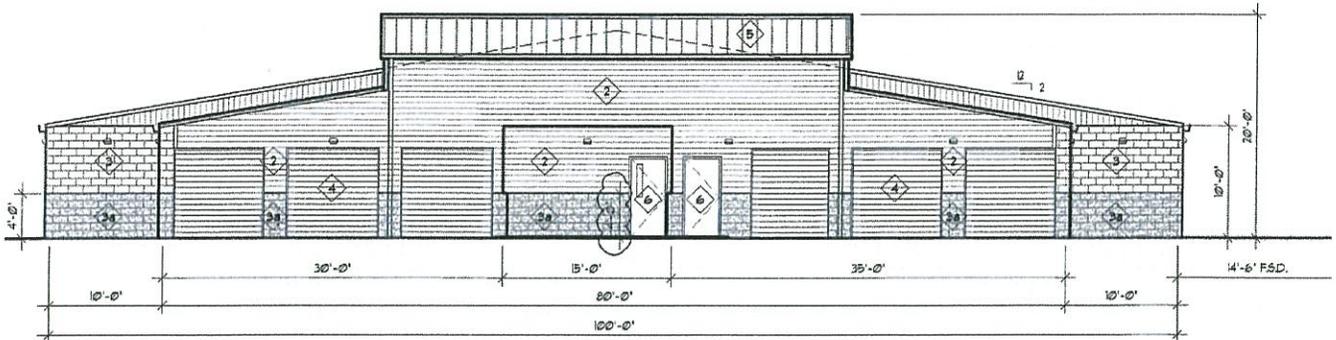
Building #7 and 10 Storage Buildings- View from SR 410; North Elevation (previously approved)
